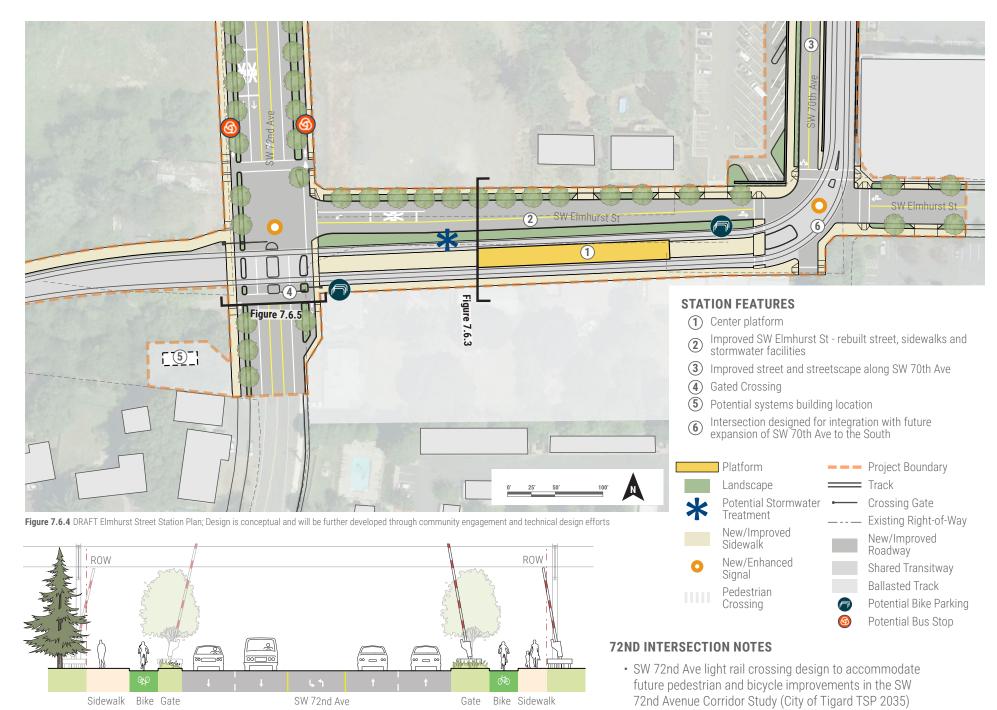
Section of SW 72nd Ave Crossing Gates
